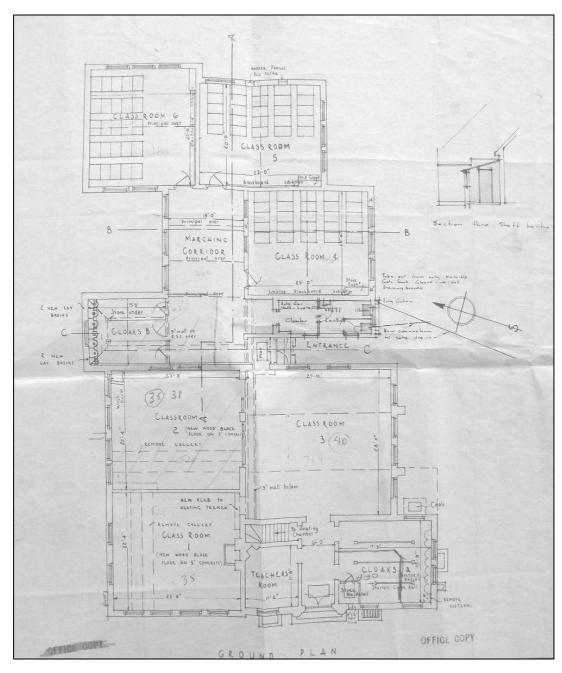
Ground plan of Stafford Stone Road County Primary School for proposed alterations, 1948 (Ref: D4009/3/4)
